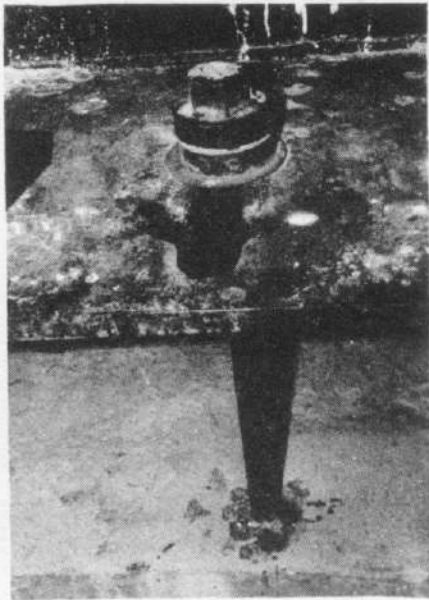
Arrangement of Stopper Connecting Suspended Span and Free End of Cantilever
